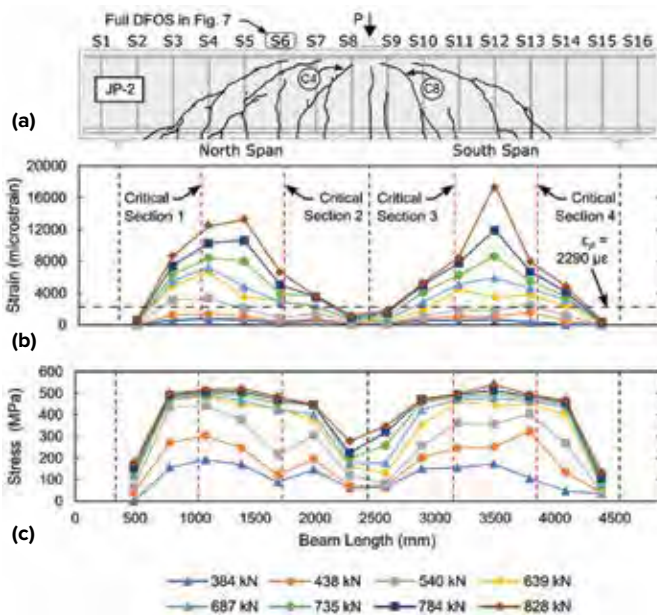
Peak stirrup demand for all stirrups in JP-2: (a) cracking pattern for JP-2 at ULS; (b) strains from DFOS; and (c) stresses
